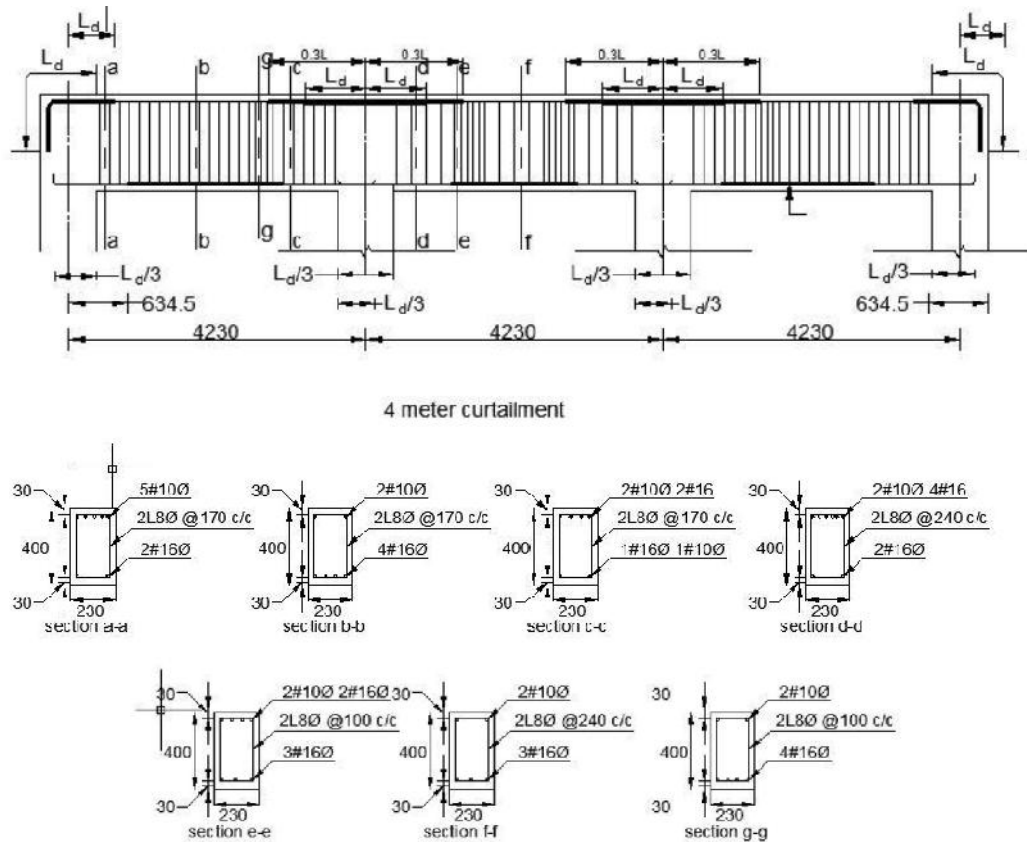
Reinforcement Detailing for BM 1 (Curtailment Method)
